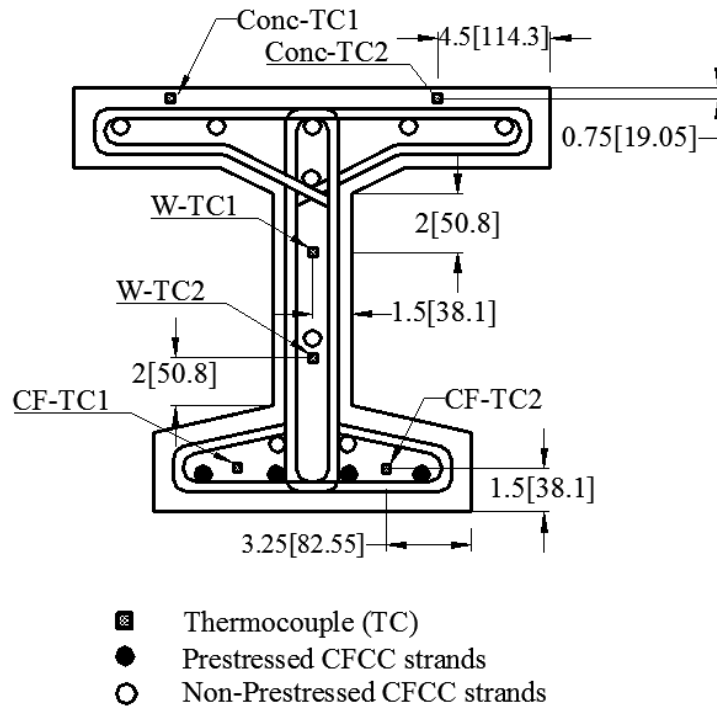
Thermocouple location in the quarter sections, all dimensions are in in. [mm]
